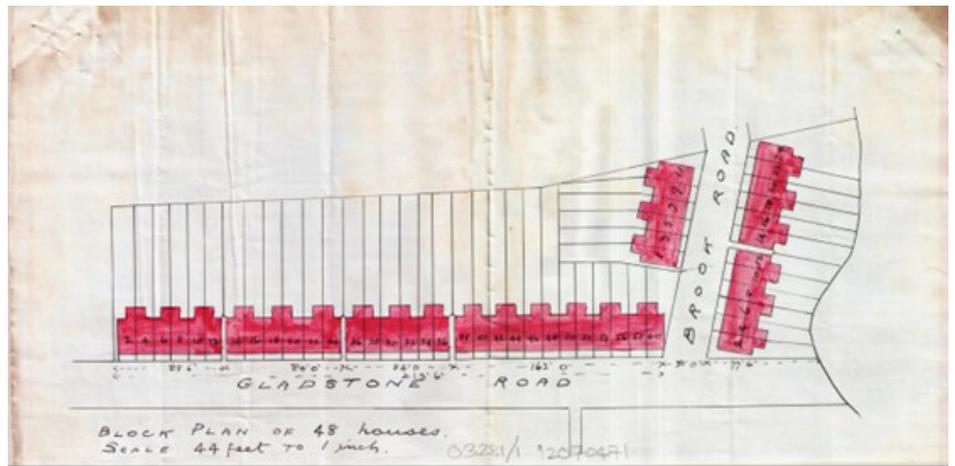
Block plan for a larger application of 48 houses, prepared by local surveyor Ernest Pennington, 1898 (Richmond Local Studies Archive, PLA/03468)
